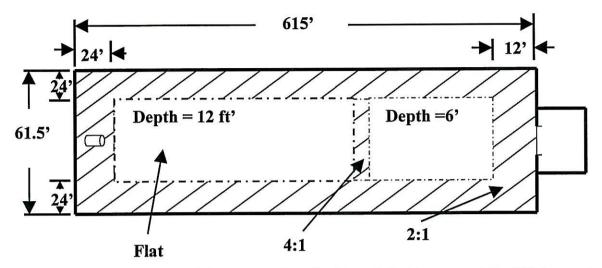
G.4-1 Plan View of FAA 10:1 Pond at the Top of the Permanent Pool Volume. (NOT TO SCALE)
